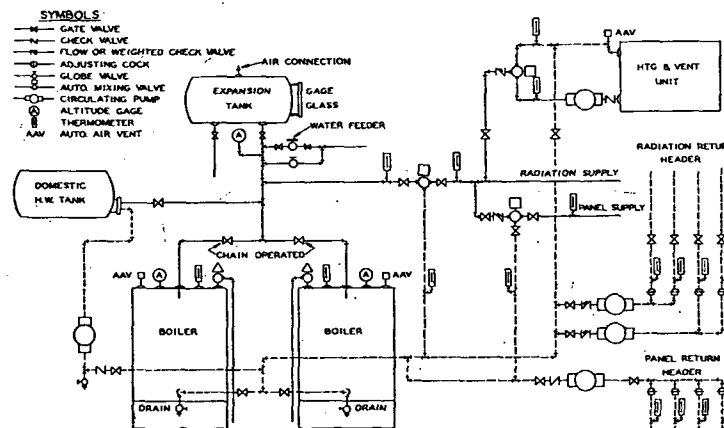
Boiler Piping for Multiple-Zone Multiple-Purpose Heating System
